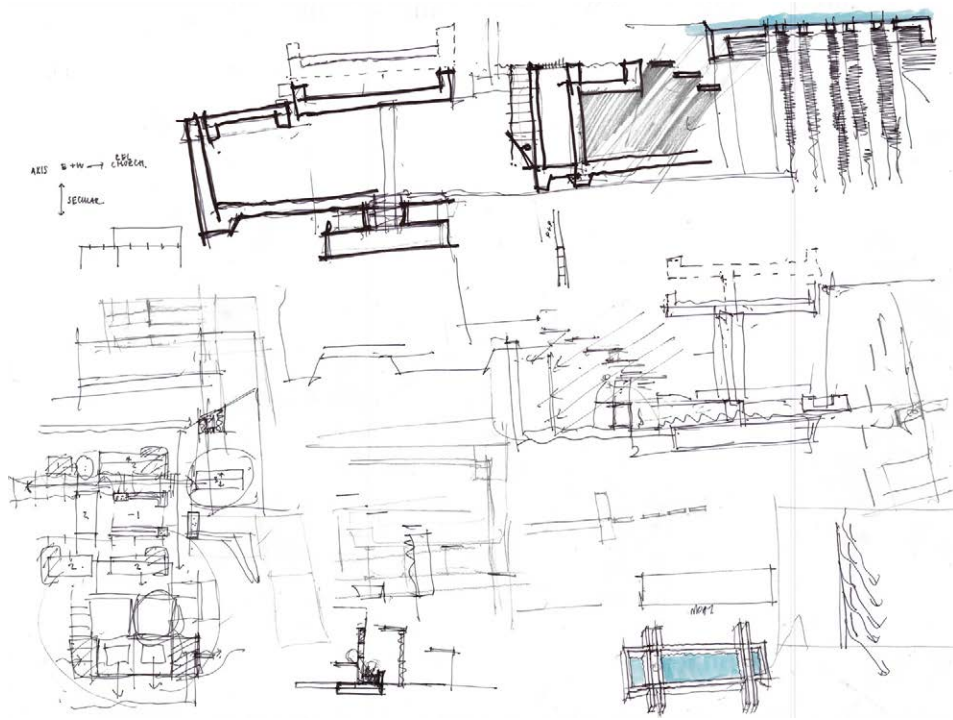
Section A-A and steel and glass detail exploration (Author, 2018)
